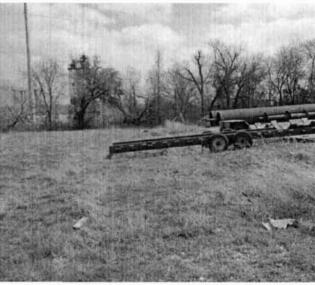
Equipment encroaching on the site on the north side of the paved parking area.
